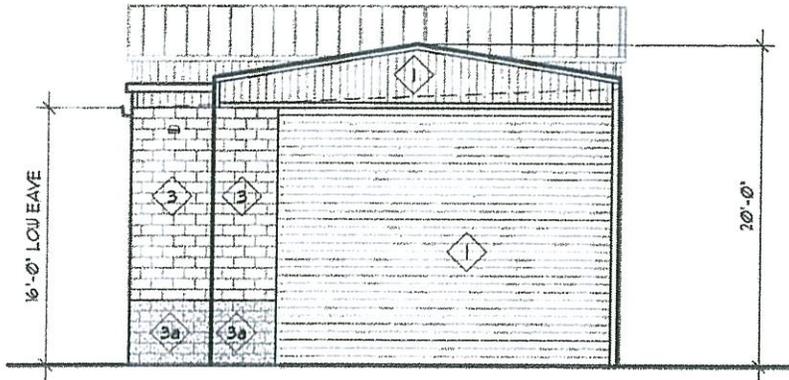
Building #6 Storage Building North Elevation (proposed amended)
